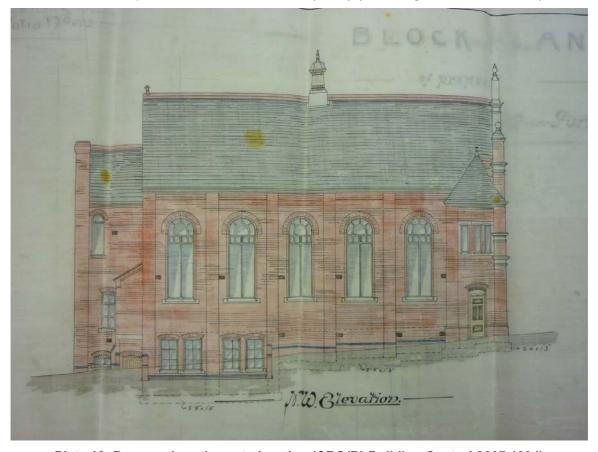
Proposed north-west elevation (CRO(B) Building Control 3237 1894)
